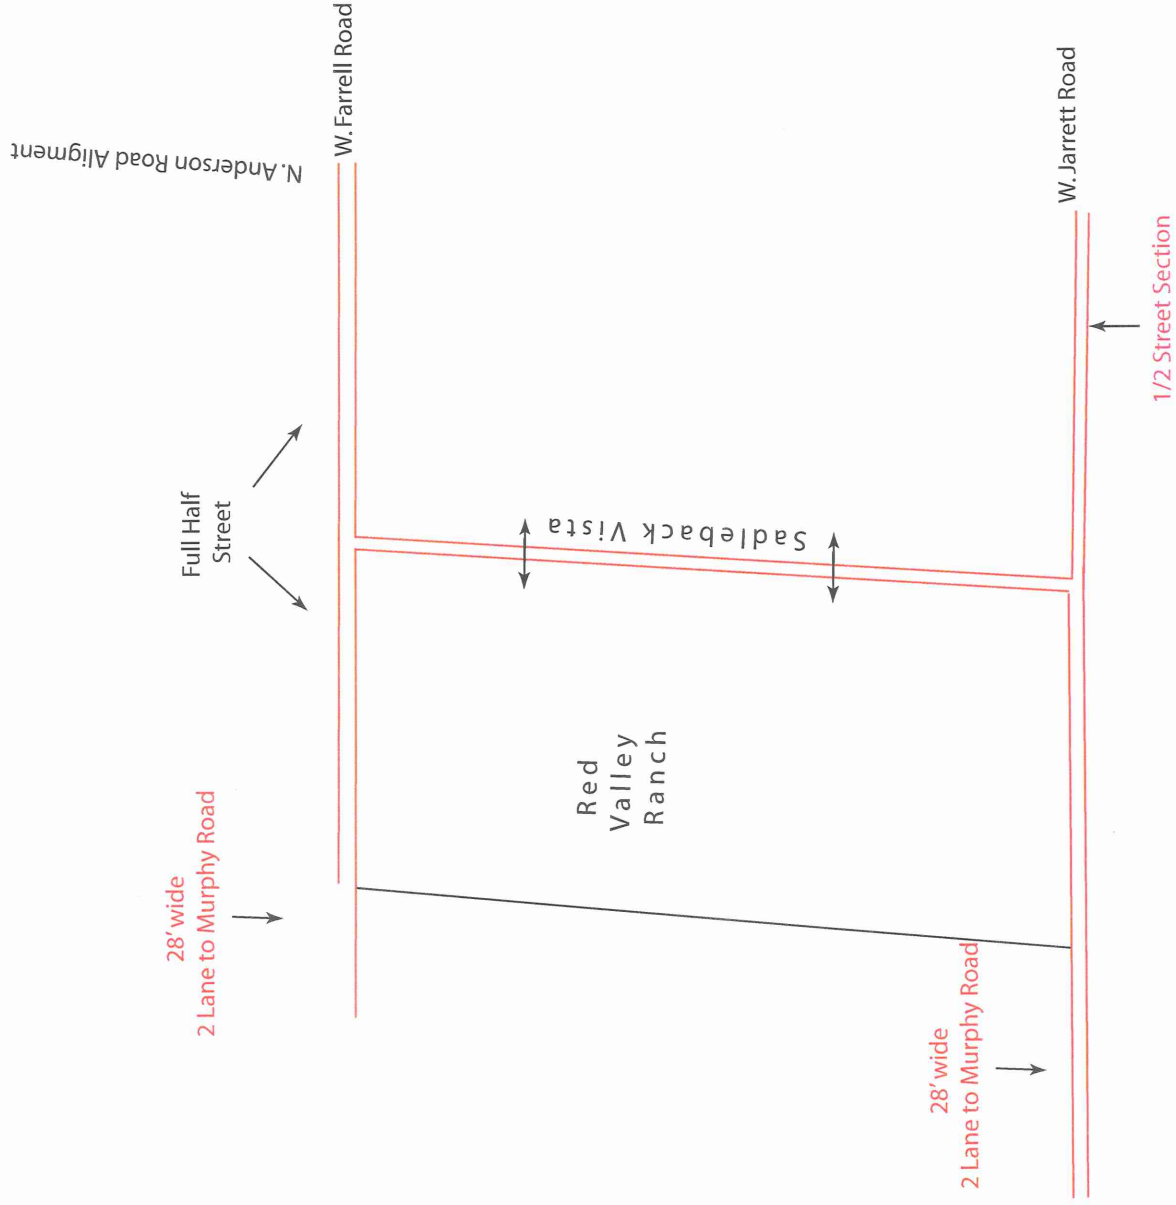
describes Option # 1 access concept through and around Red Valley Ranch. Farrell Road is built out to a full half street section adjacent to the site, including sidewalk, curb and gutter. N. Saddleback Vista Avenue is a north south collector and would be built in its full street cross section to connect to all lots in Red Valley Ranch.
